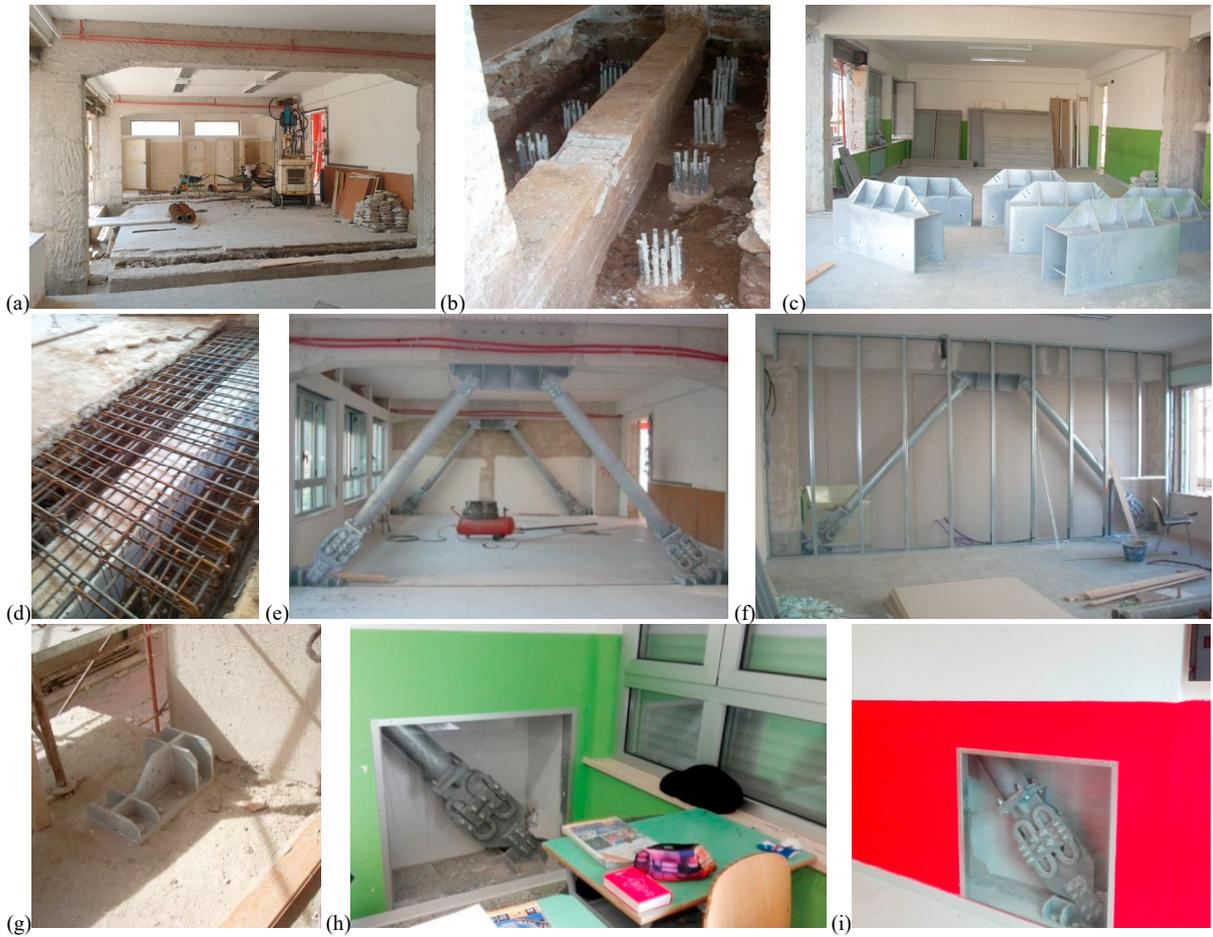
(a) Excavations in foundation; (b) Construction of micropiles; (c) Connecting plates of damped brace to beam; (d) Rebars in foundation slab; (e) Internal damped braces; (f) Construction of partitions; (g) Connection of damped brace to foundation; (h) - (i) Visible dampers.
